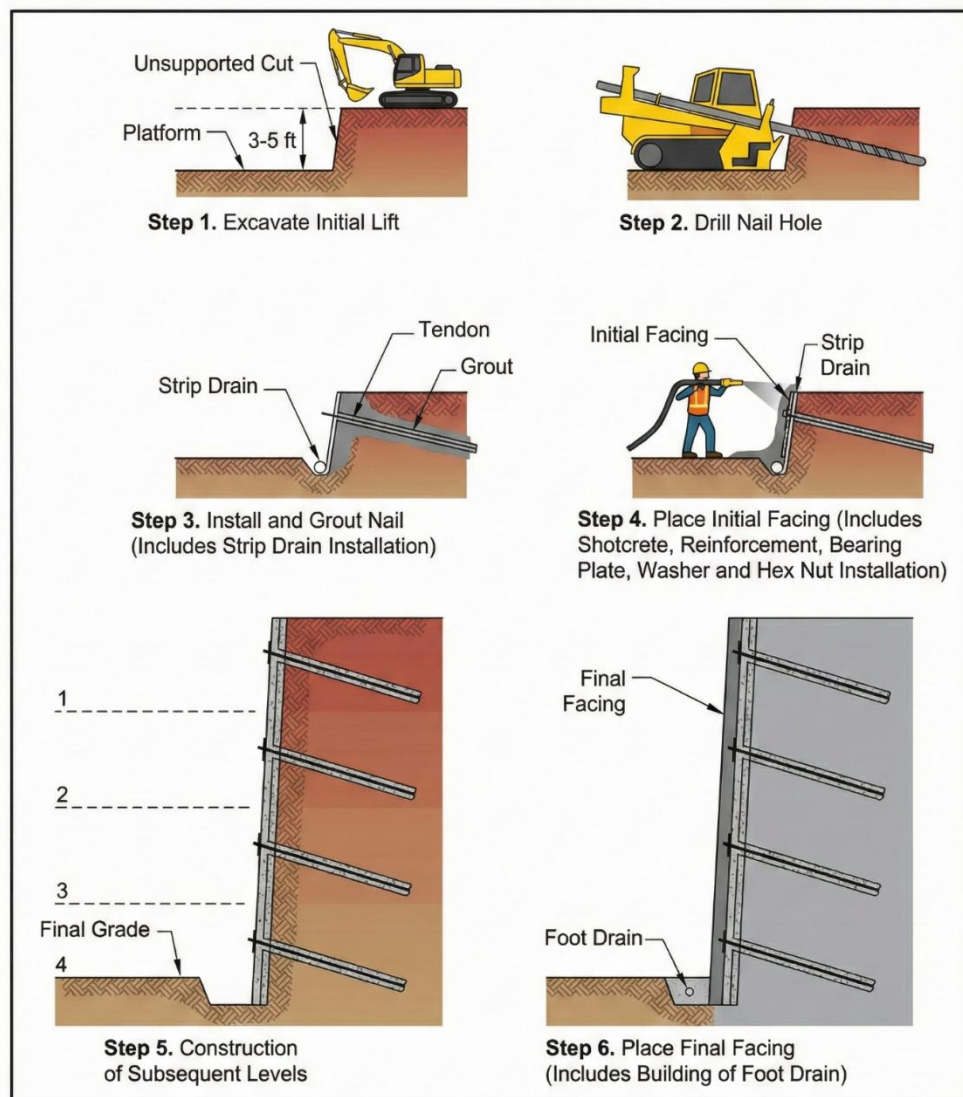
Typical cross-section and construction sequence of a soil nail wall, illustrating top-down excavation, nail installation, and shotcrete facing application (Porterfield et al., 1994)
